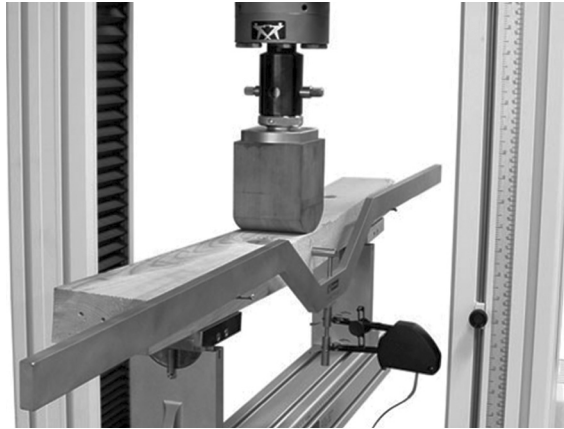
Typical bend testing fixture with a test specimen loaded and ready to be tested
